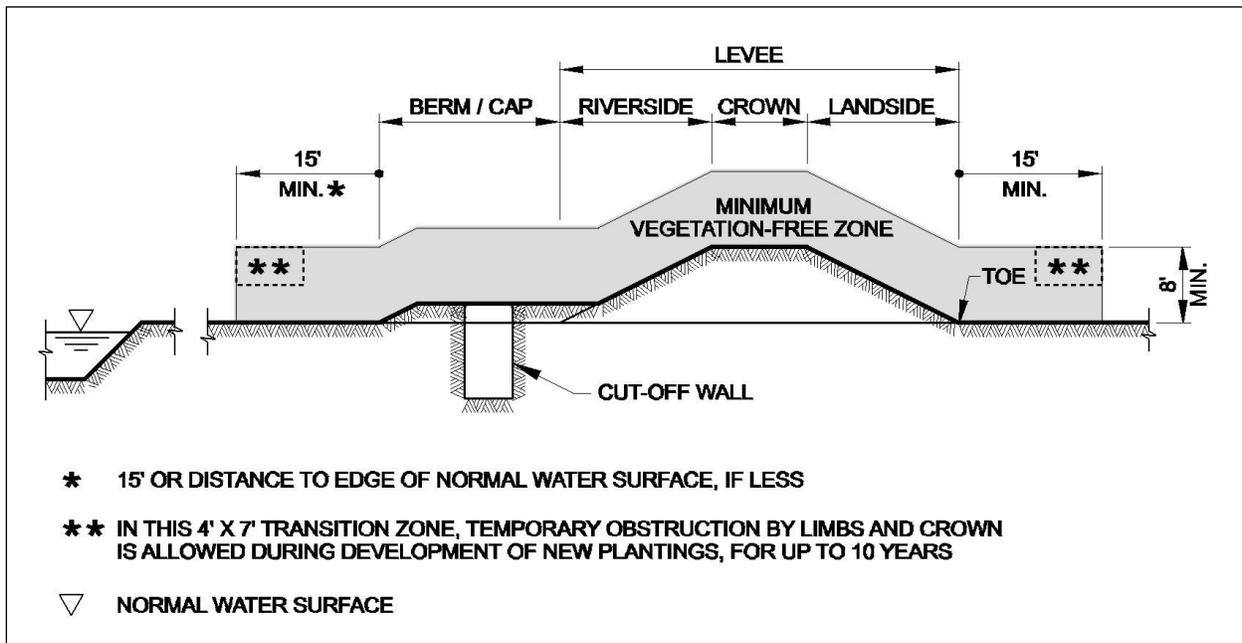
Levee Section with Cut-Off Wall and Impervious Berm.
